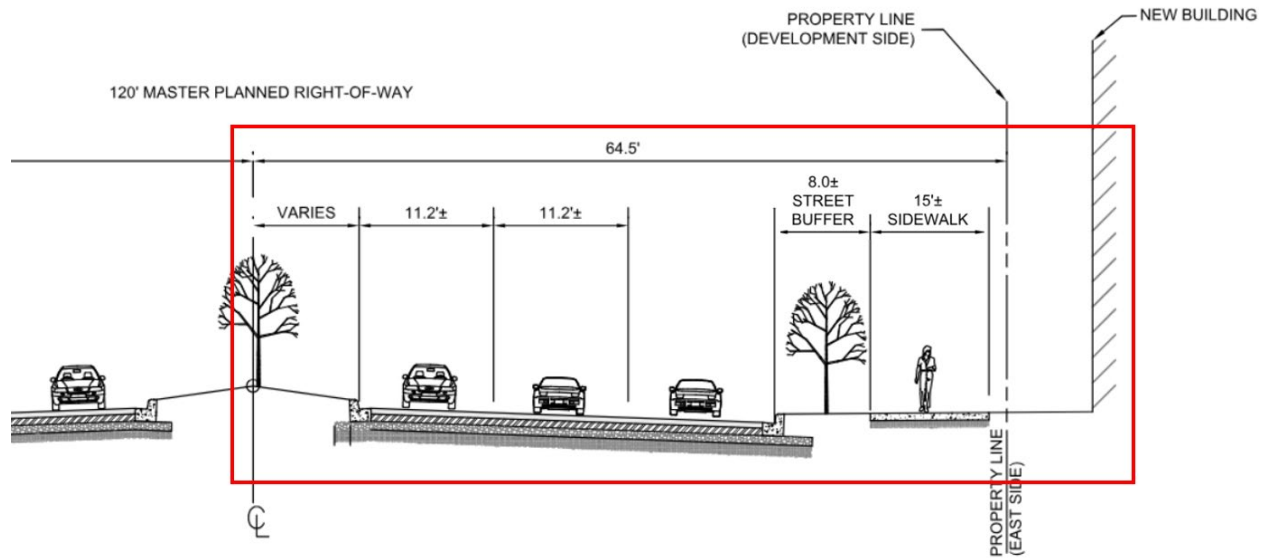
Georgia Avenue (MD 97) Interim Cross-Section
